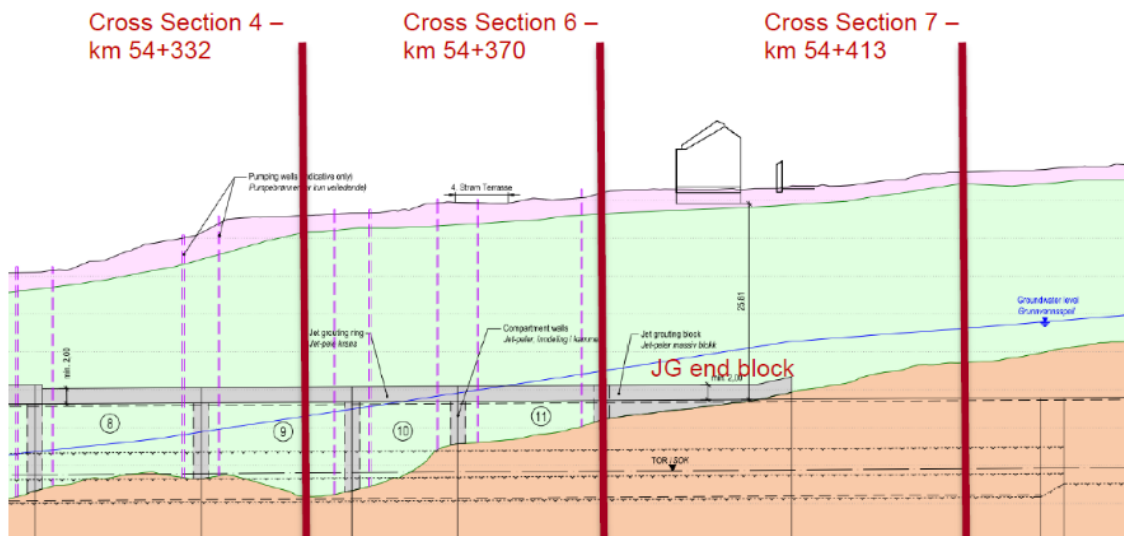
Longitudinal section of mixed face excavation from C8-12 from ILF (2020d)
